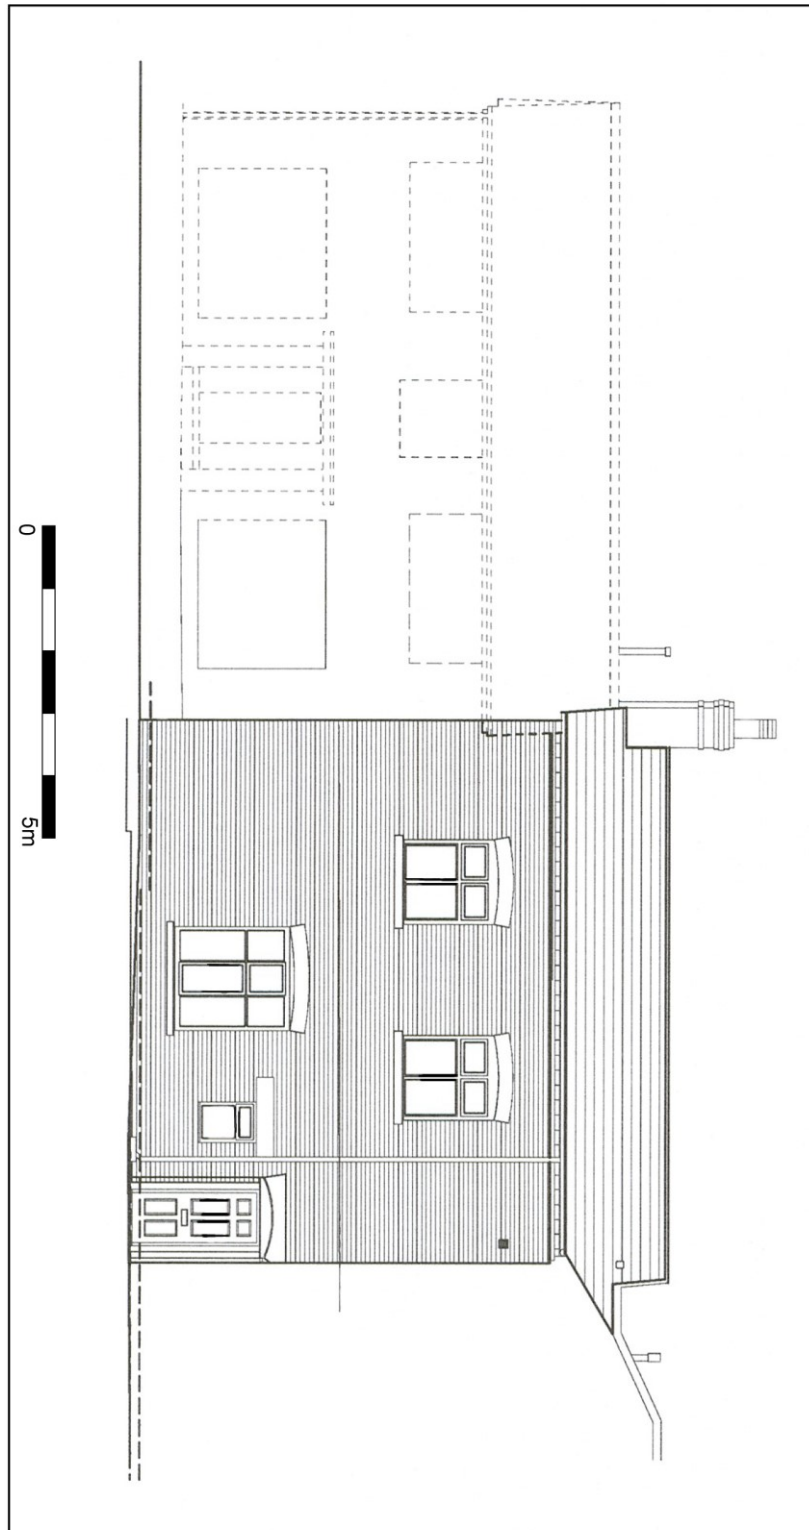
S-facing Elevation of W Extension to No. 38 South Street
